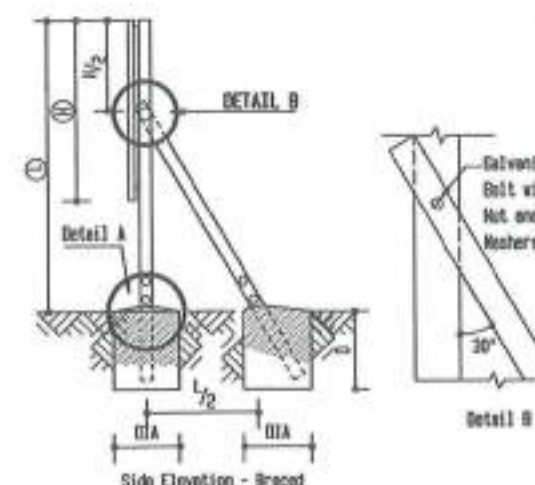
Sign Manufactured from Road Sign Profiles
